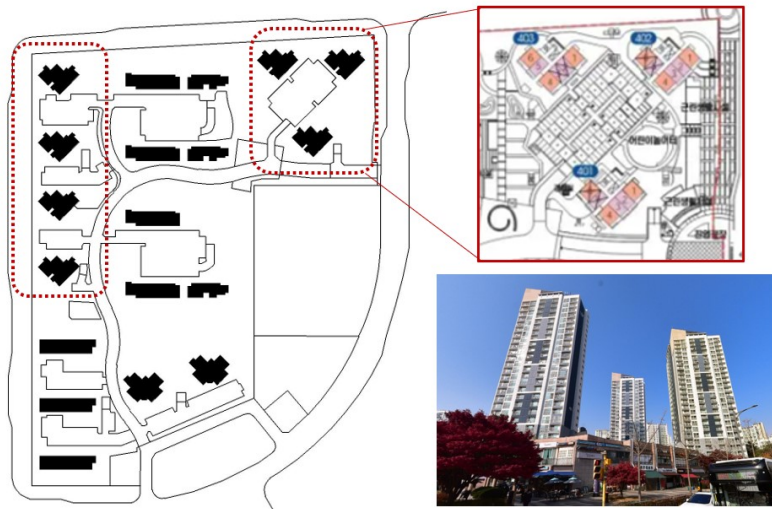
a tower-type apartment building (Baekhyeon Village Complex 4) as an example.
